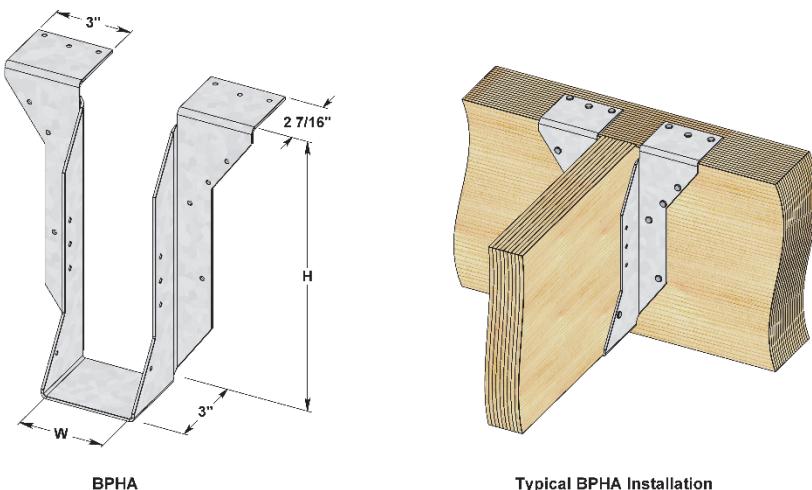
BPHA BEAM AND PURLIN HANGER AND TYPICAL INSTALLATION DETAIL
